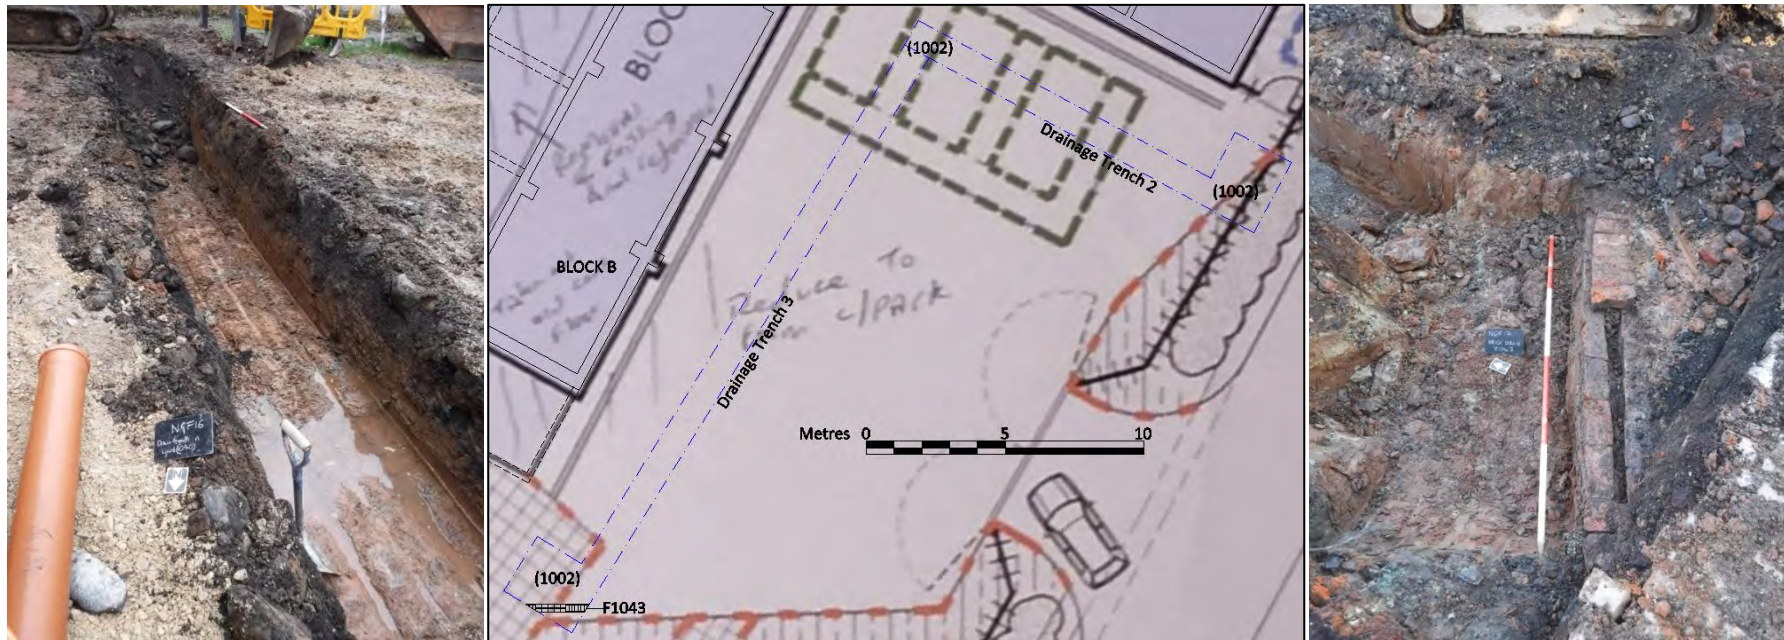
(Left) Drainage Trench 2 showing courtyard cobbles (1040), bedding material (1041) and natural substrate (1002), looking south. Scale: 1m. (Centre) Plan showing location of Drainage Trenches 2 and 3. Scale: as shown. (Right) Brick-built drain F1043 in south-western end of Drainage Trench 3. Scale: 2m.
